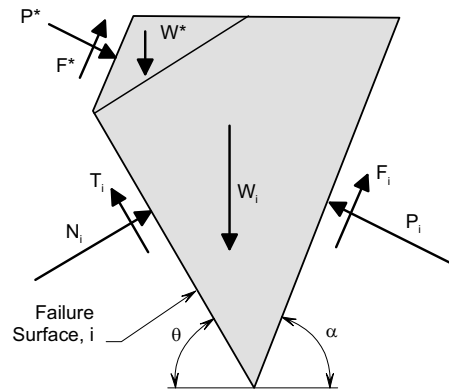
Forces on backfill wedge defined by failure surface, i, when opposite wall is intersected.
